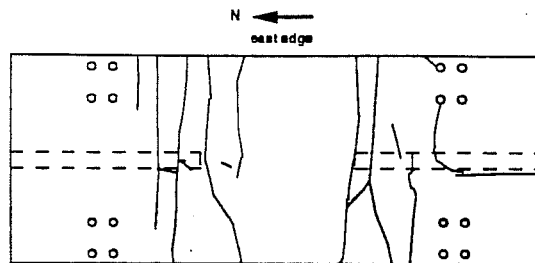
Sp. 2b: Progression of Cracking of Top Face of Roof Slab at Load Point 177
